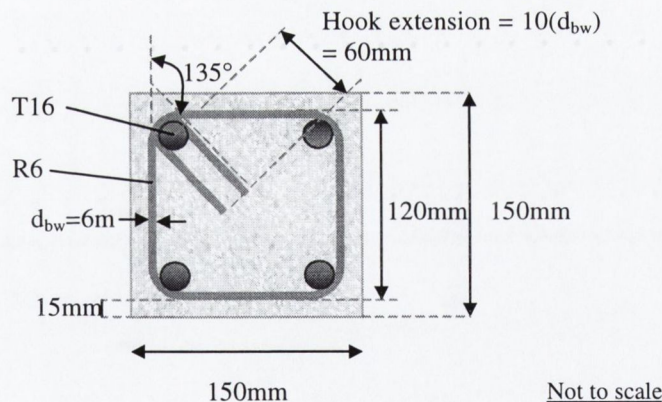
Cross-section details of stub column specimens (Test Series 1)
